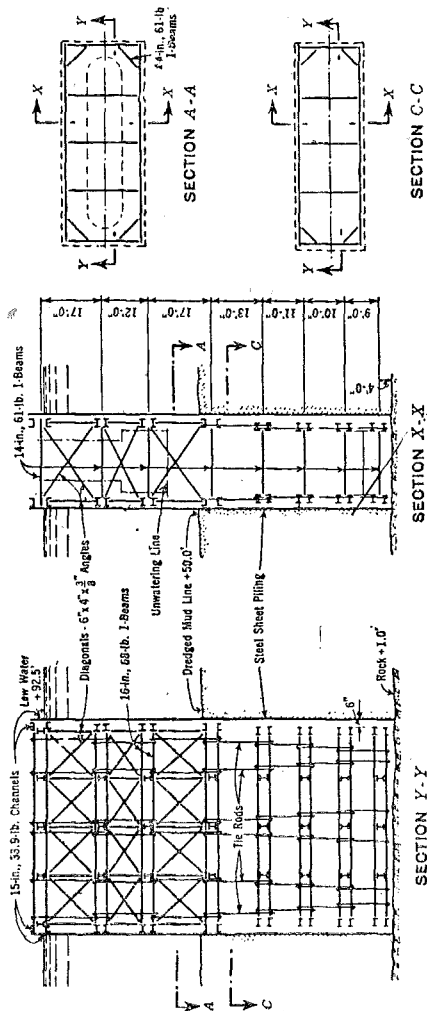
COFFERDAM FOR A PIER OF THE LAKE CHAMPLAIN BRIDGE.
